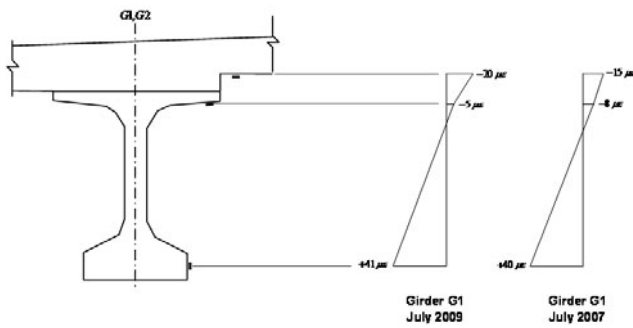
Strains over girder height for girder G1 for truck position 4 (Figure 6)
